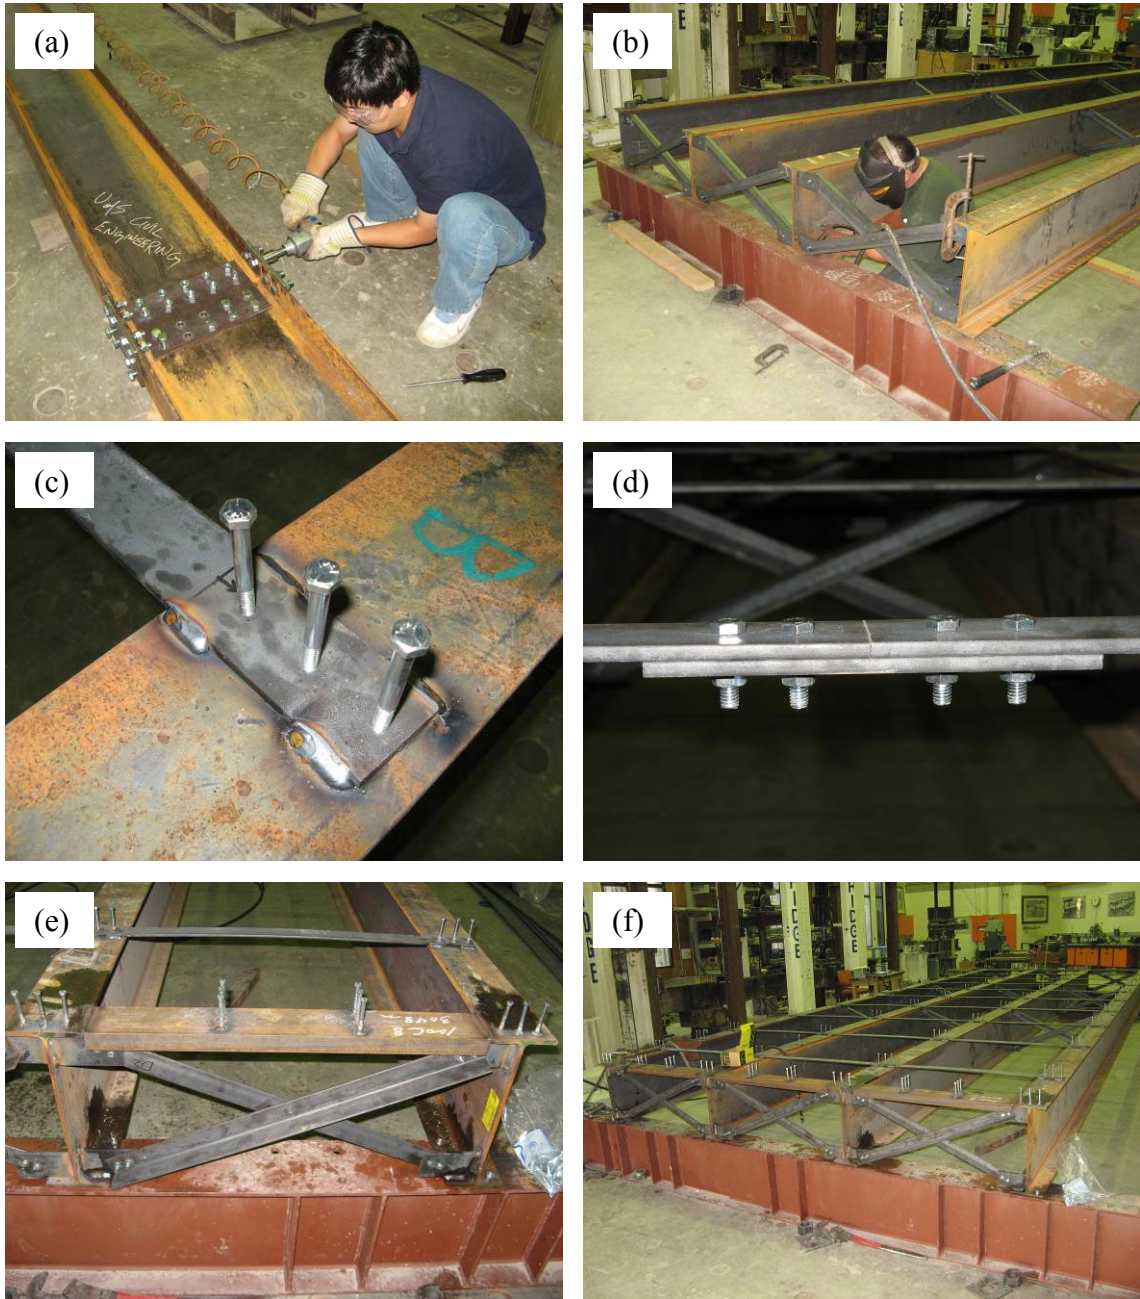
Fabrication of steel superstructure of the bridge model: (a) bolt connected girder splice, (b) cross bracing diaphragm, (c) shear studs, (d) bolt connected steel strap splice, (e) extra channel member with shear studs at the end of the girders, and (f) the fabricated whole steel superstructure.
